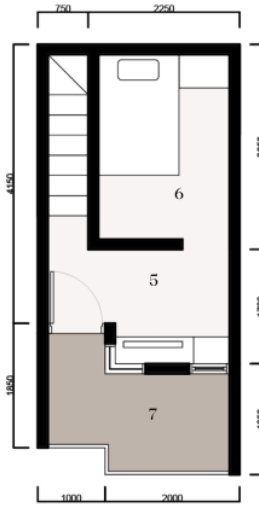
G3 - 2nd floor layout plan, scale 1:100
